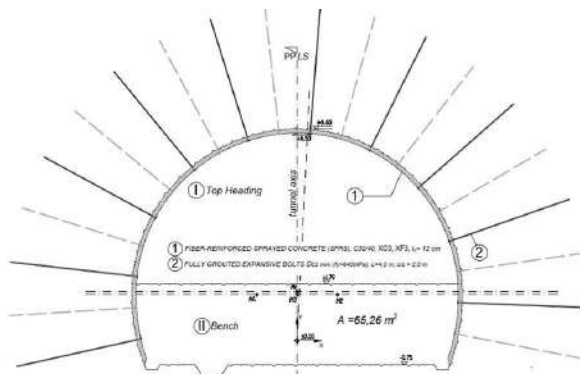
Typical cross-section of the "protective" layer for the tunnel with the single-layer load-bearing lining (Source: Spasojevic, 2022, 2025).
